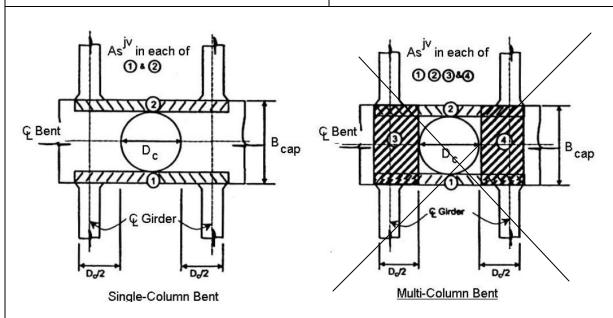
Location of Vertical Joint Shear Reinforcement
